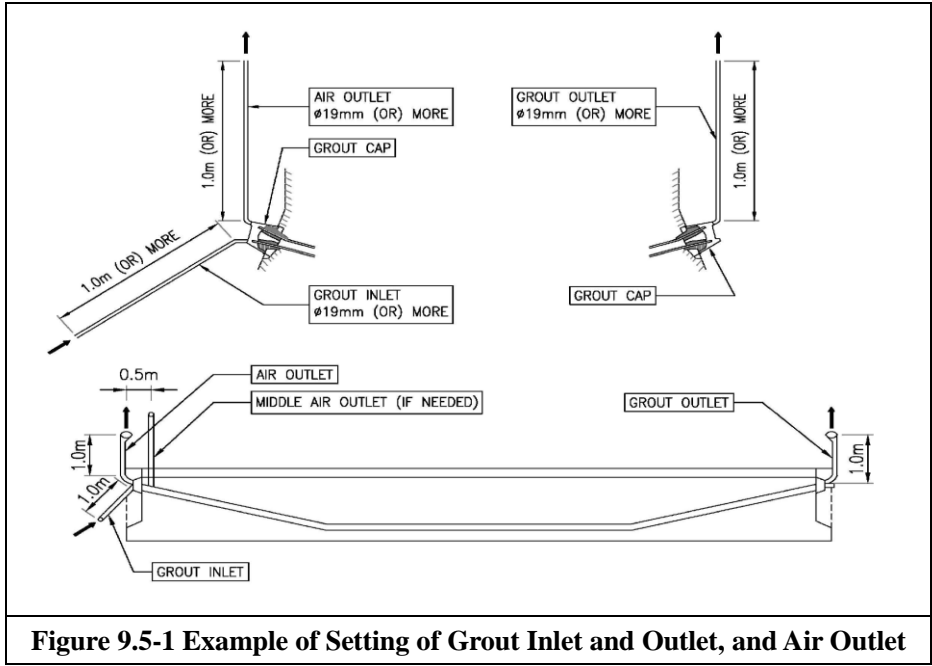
Example of Setting of Grout Inlet and Outlet, and Air Outlet
